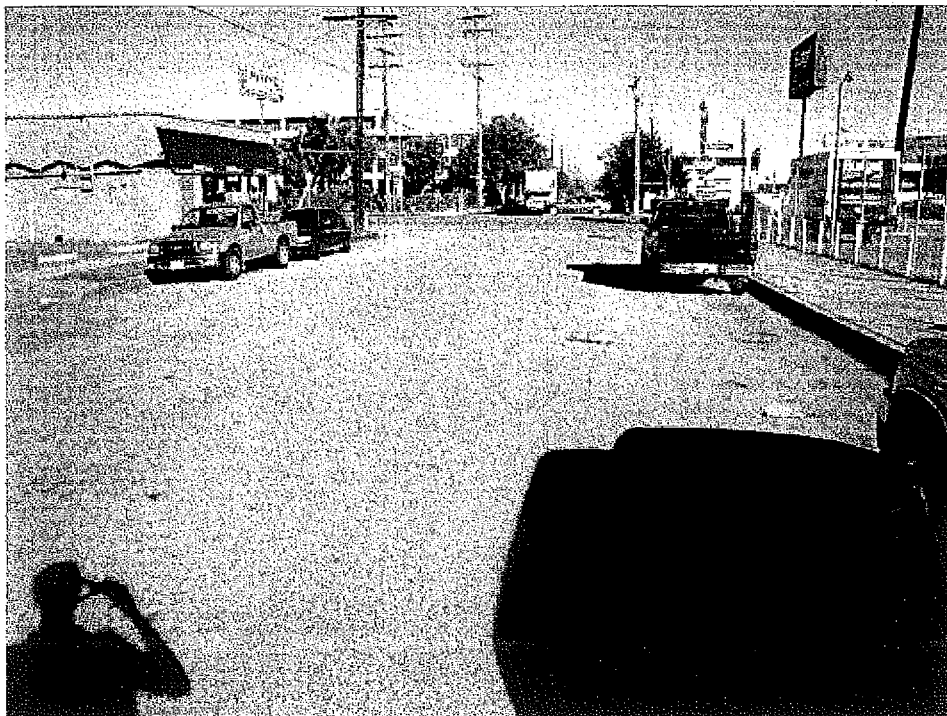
Intersection of Osage Avenue and Manchester Avenue. Looking North
